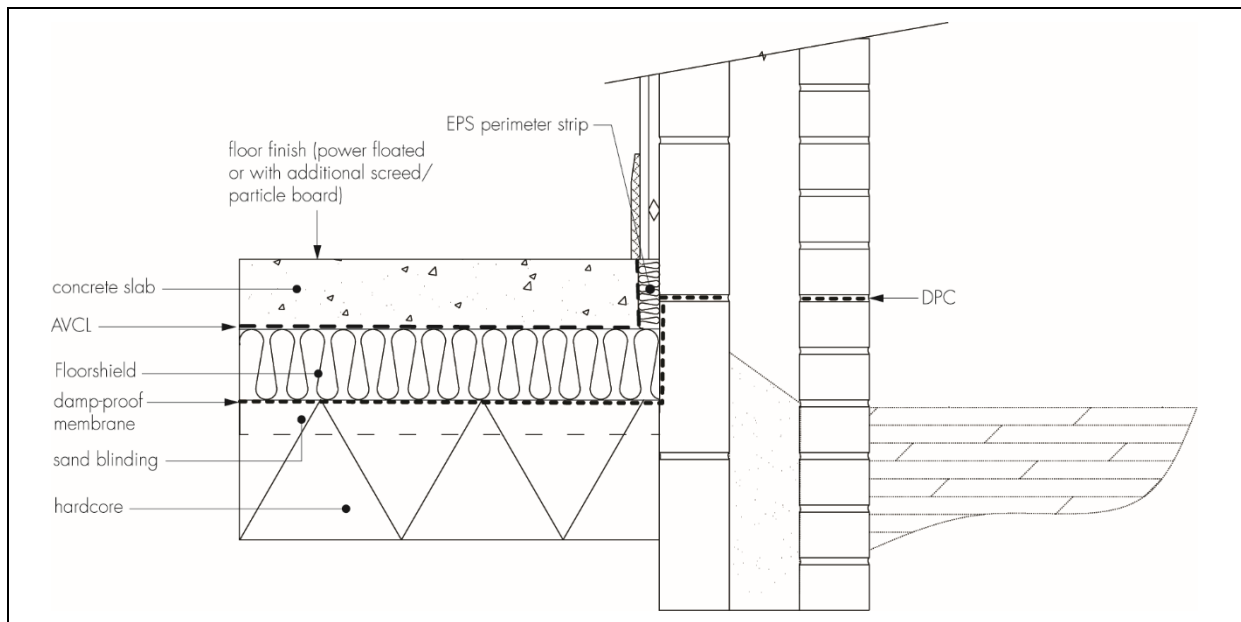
Typical installation details — under concrete slab (DPM under insulation)
